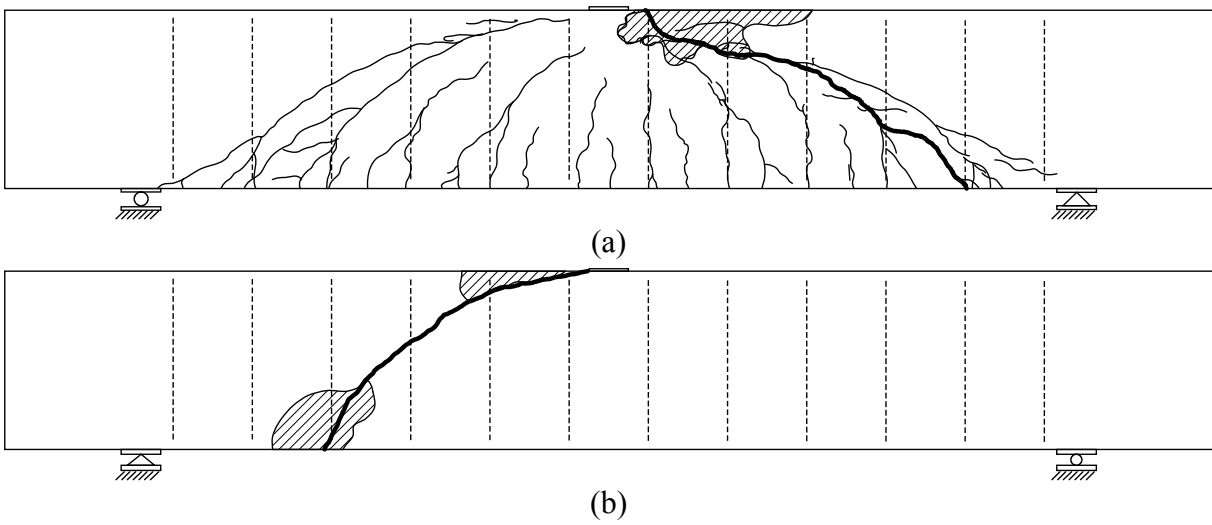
Observed damage in specimen P1S3, (a) front side, (b) back side
